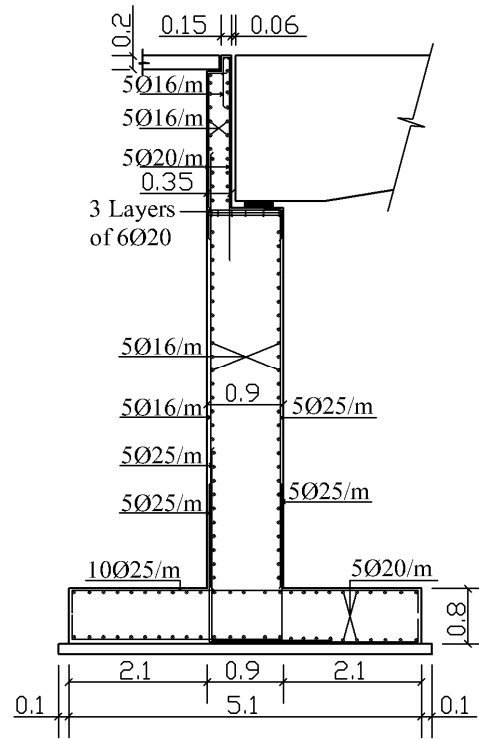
Alharamain Bridge Abutment #1 Details (Dimensions in meter).
